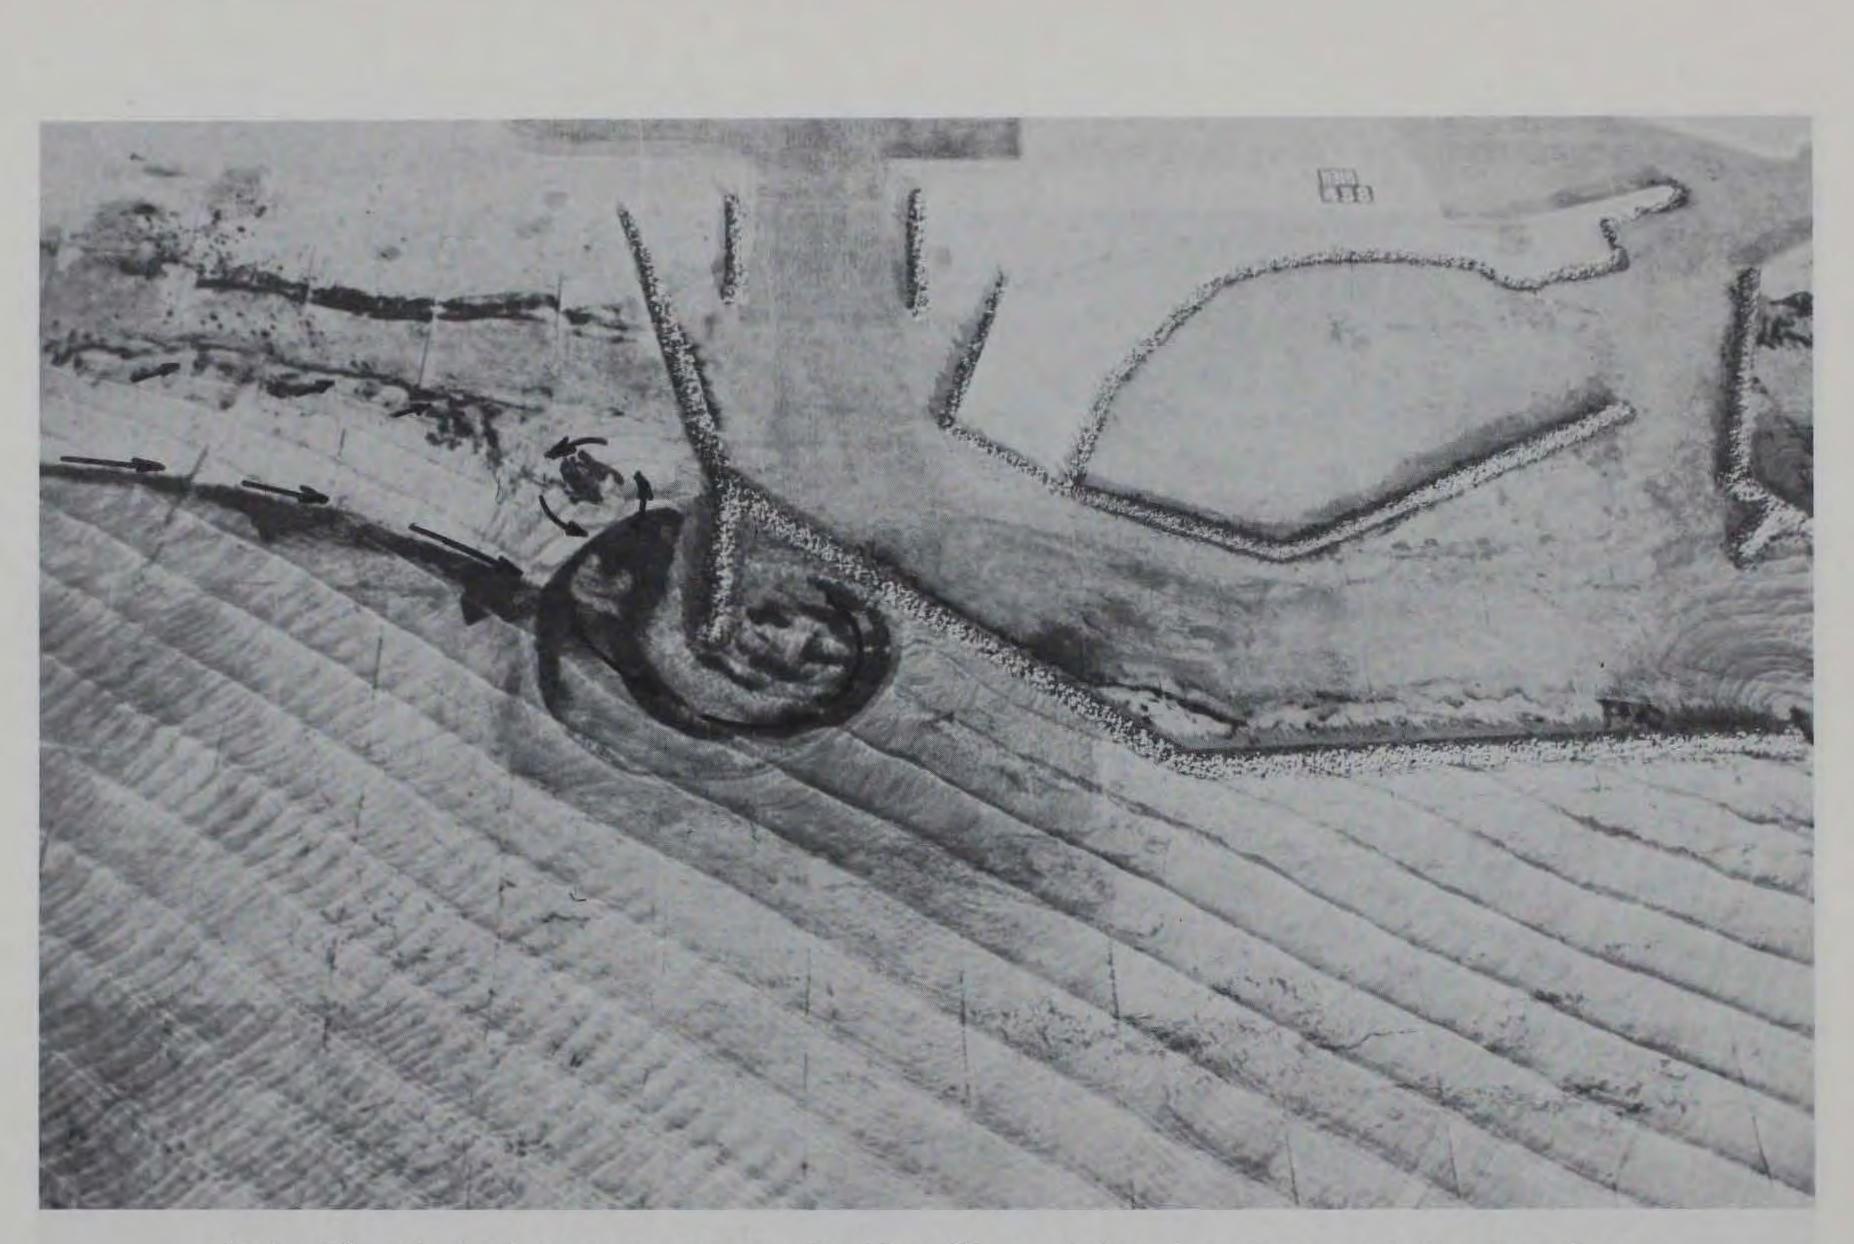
Typical tracer movement for Plan 62 resulting from 7-sec, 10-ft waves from northwest at mllw
